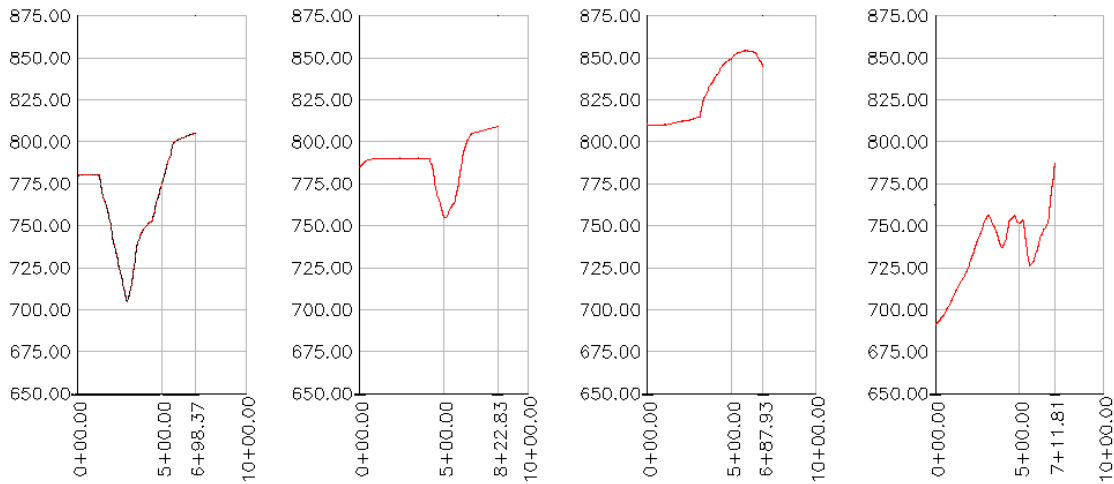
Elevation (feet) vs. Stationing of Profiles B, C, D, and E
